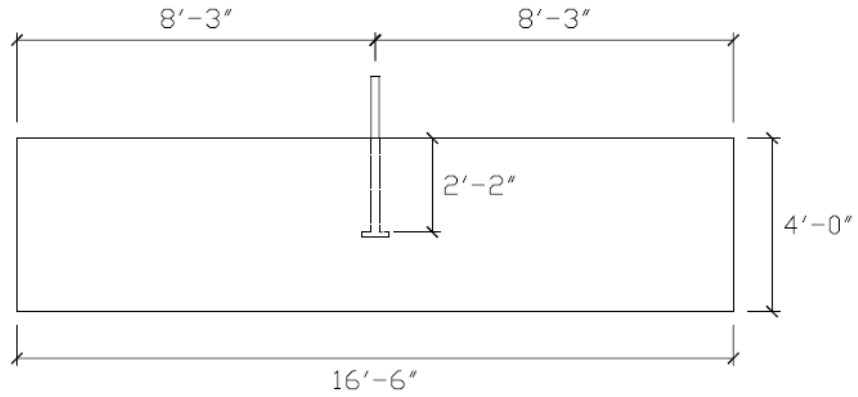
Elevation view of Specimen 12 (Specimen 13 had the same design but had a bar embedment length of 3'-1")
